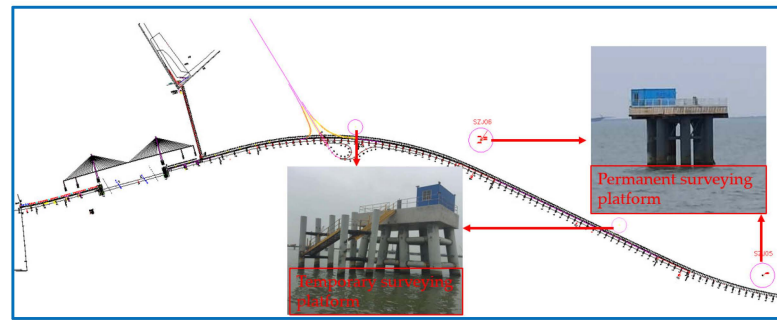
The survey platform layout of the Shenzhen-Zhongshan Bridge.
